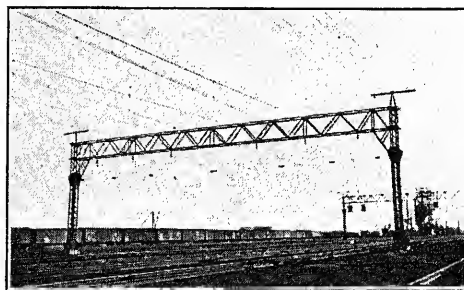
TYPICAL 6-TRACK CONSTRUCTION
